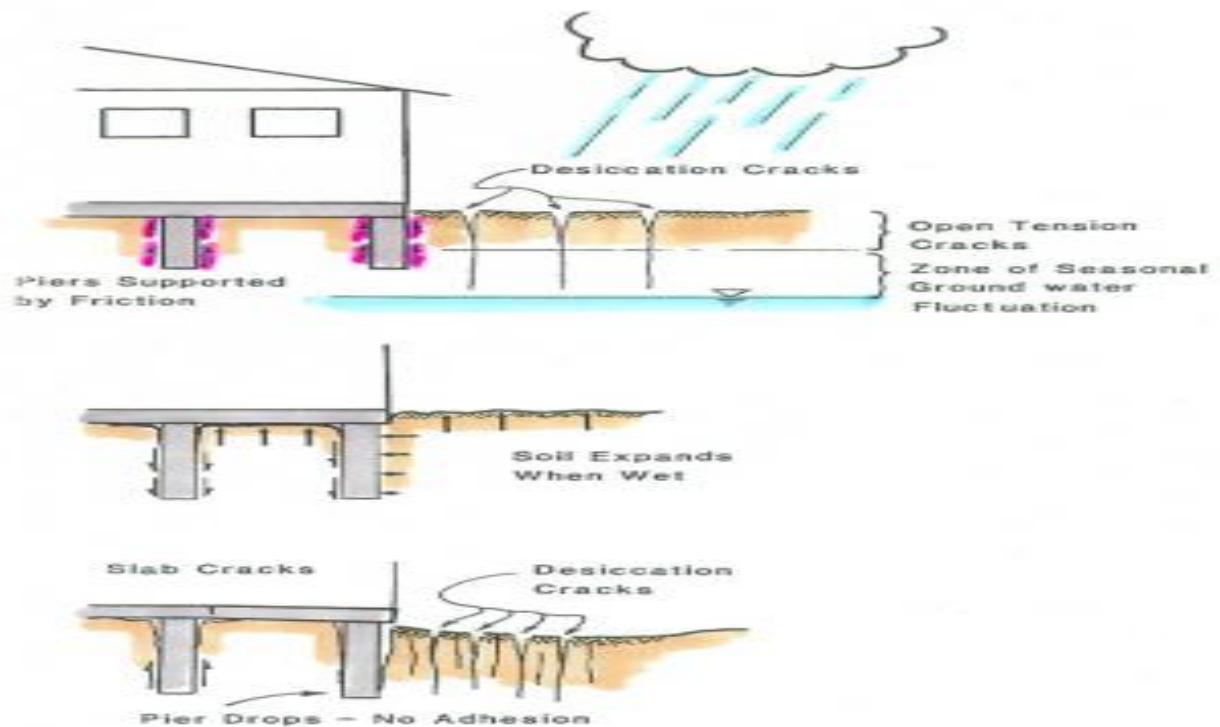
Damage to home supported on shallow piers (J. David Rogers, Robert Olshansky, et al).
